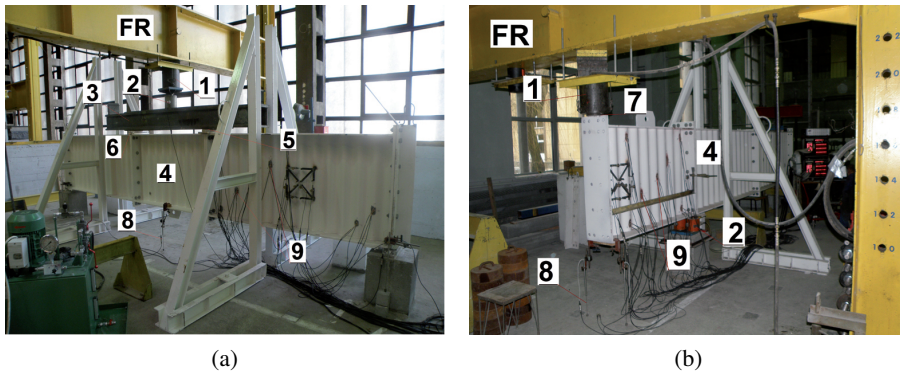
Example of girders on the test stand: a) girder 2.41; b) girder 2.42
